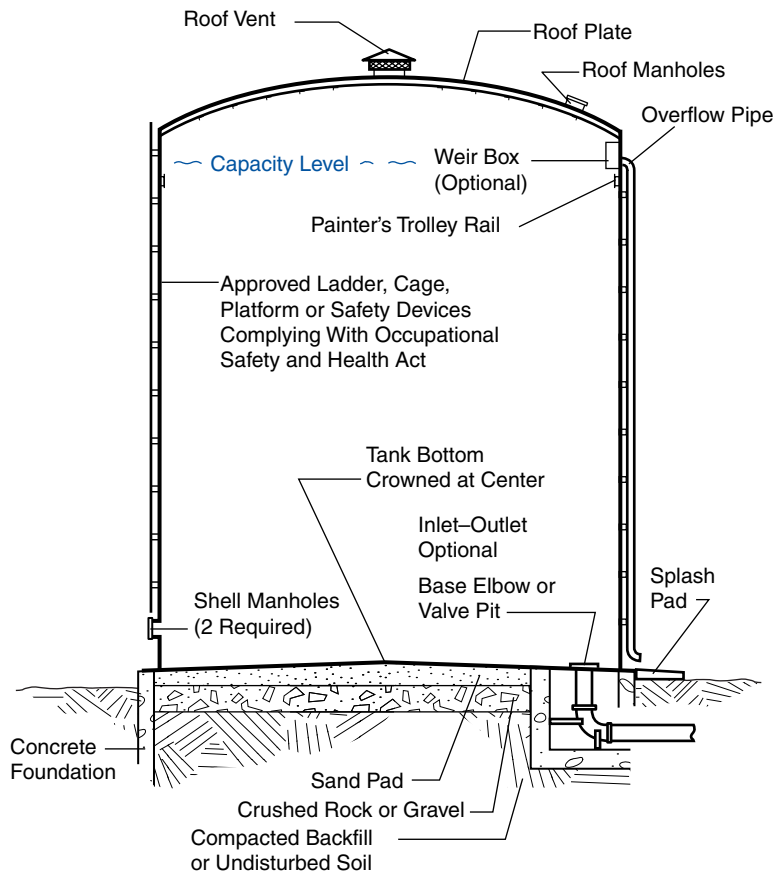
Cross-sectional view of a typical welded steel standpipe
